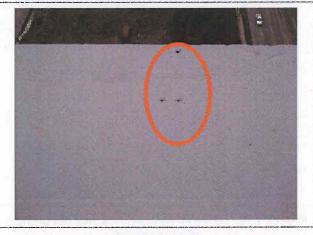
Small holes in the concrete eyebrow at the main roof.
